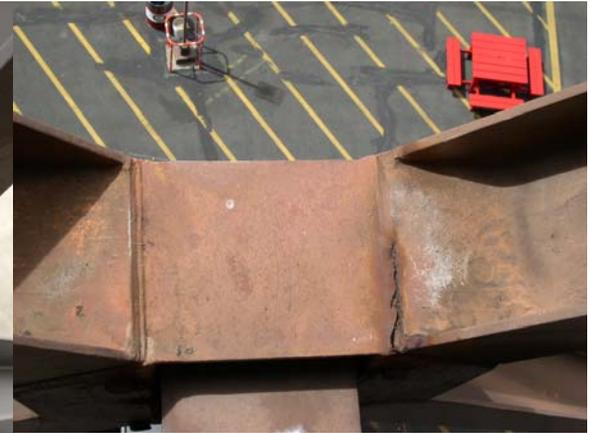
Cracked coating and corrosion observed at a hub pocket filler.
